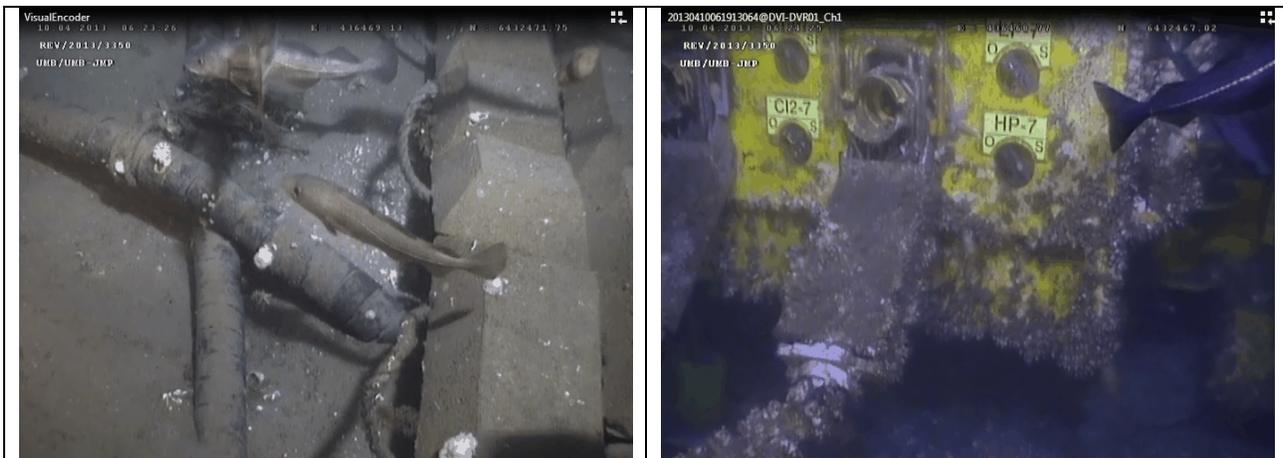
Jumpers covered with concrete mattresses (left) and jumpers fixed to well 15/12-16 S (right)
